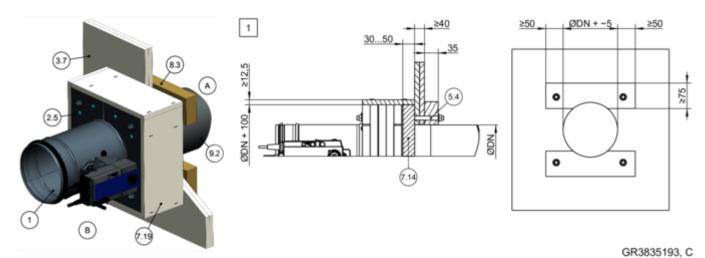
Dry mortarless installation into a shaft wall with metal support structure, with installation kit WA2
